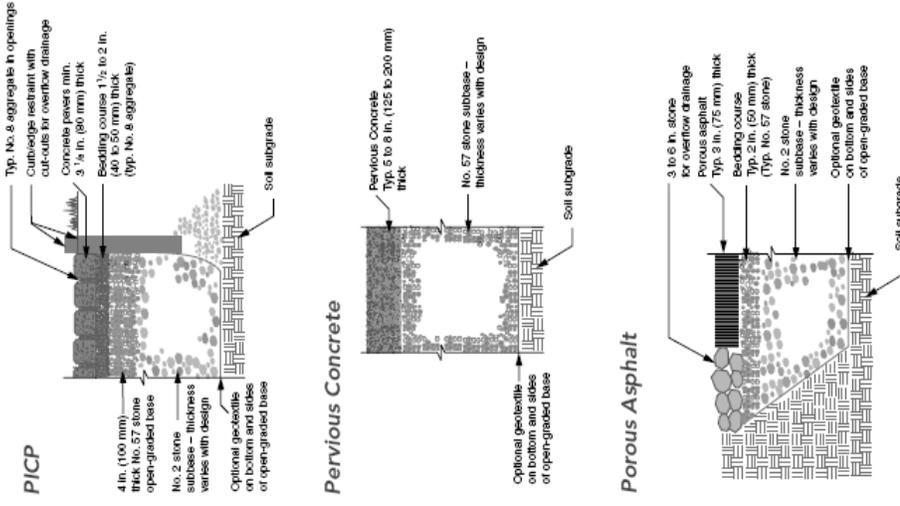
Typical PICP, pervious concrete and porous asphalt pavement sections. Surface and base thicknesses vary with traffic. Slower draining soils generally require thicker bases to store and infiltrate water. All can accommodate perforated drain pipes in the base for low infiltration soils.
